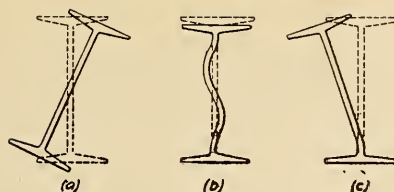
SHAPES ASSUMED BY I-BEAMS AFTER WEB FAILURE.
